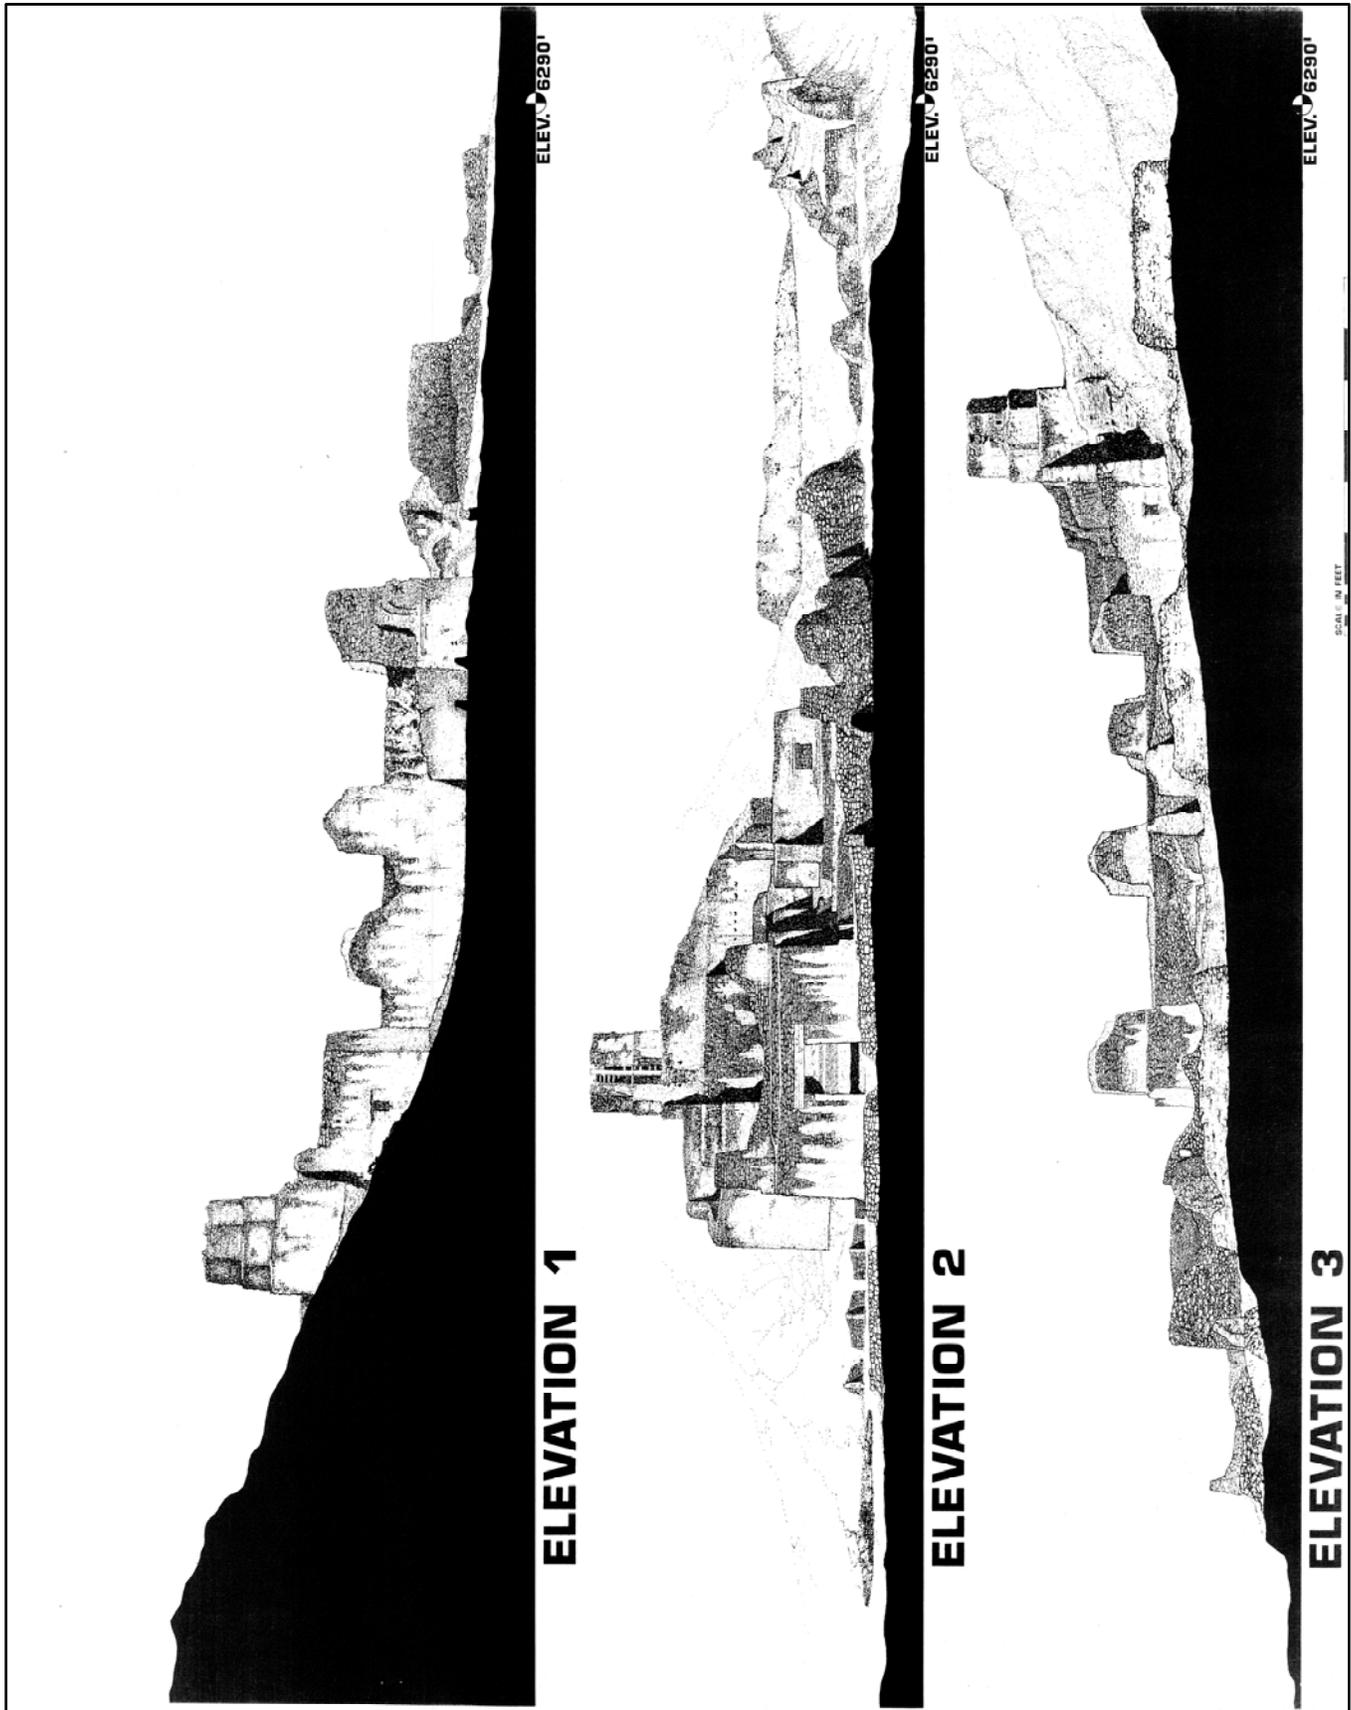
The sloping nature of the San José de los Jemez site is illustrated in these elevation drawings: 1) view east of the west elevation; 2) view north of the façade; and 3) view west of the east elevation (Luna Associates 1977).
